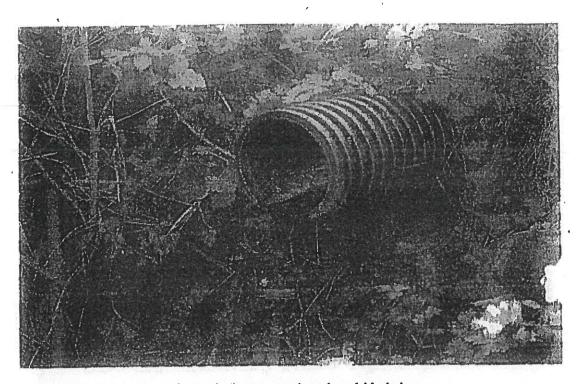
Pipe discharging to ditch drain from contaminated roadside drain
